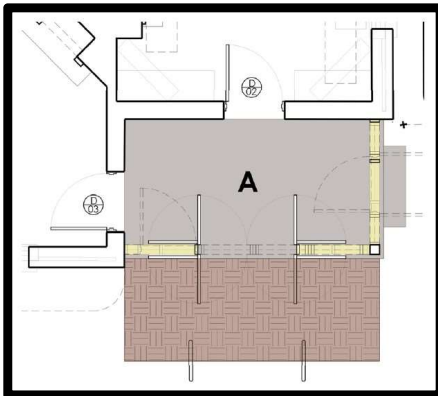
Plan for a rebuilt south porch of Bastick Cottage, reconfigured to face the south upgraded courtyard.
